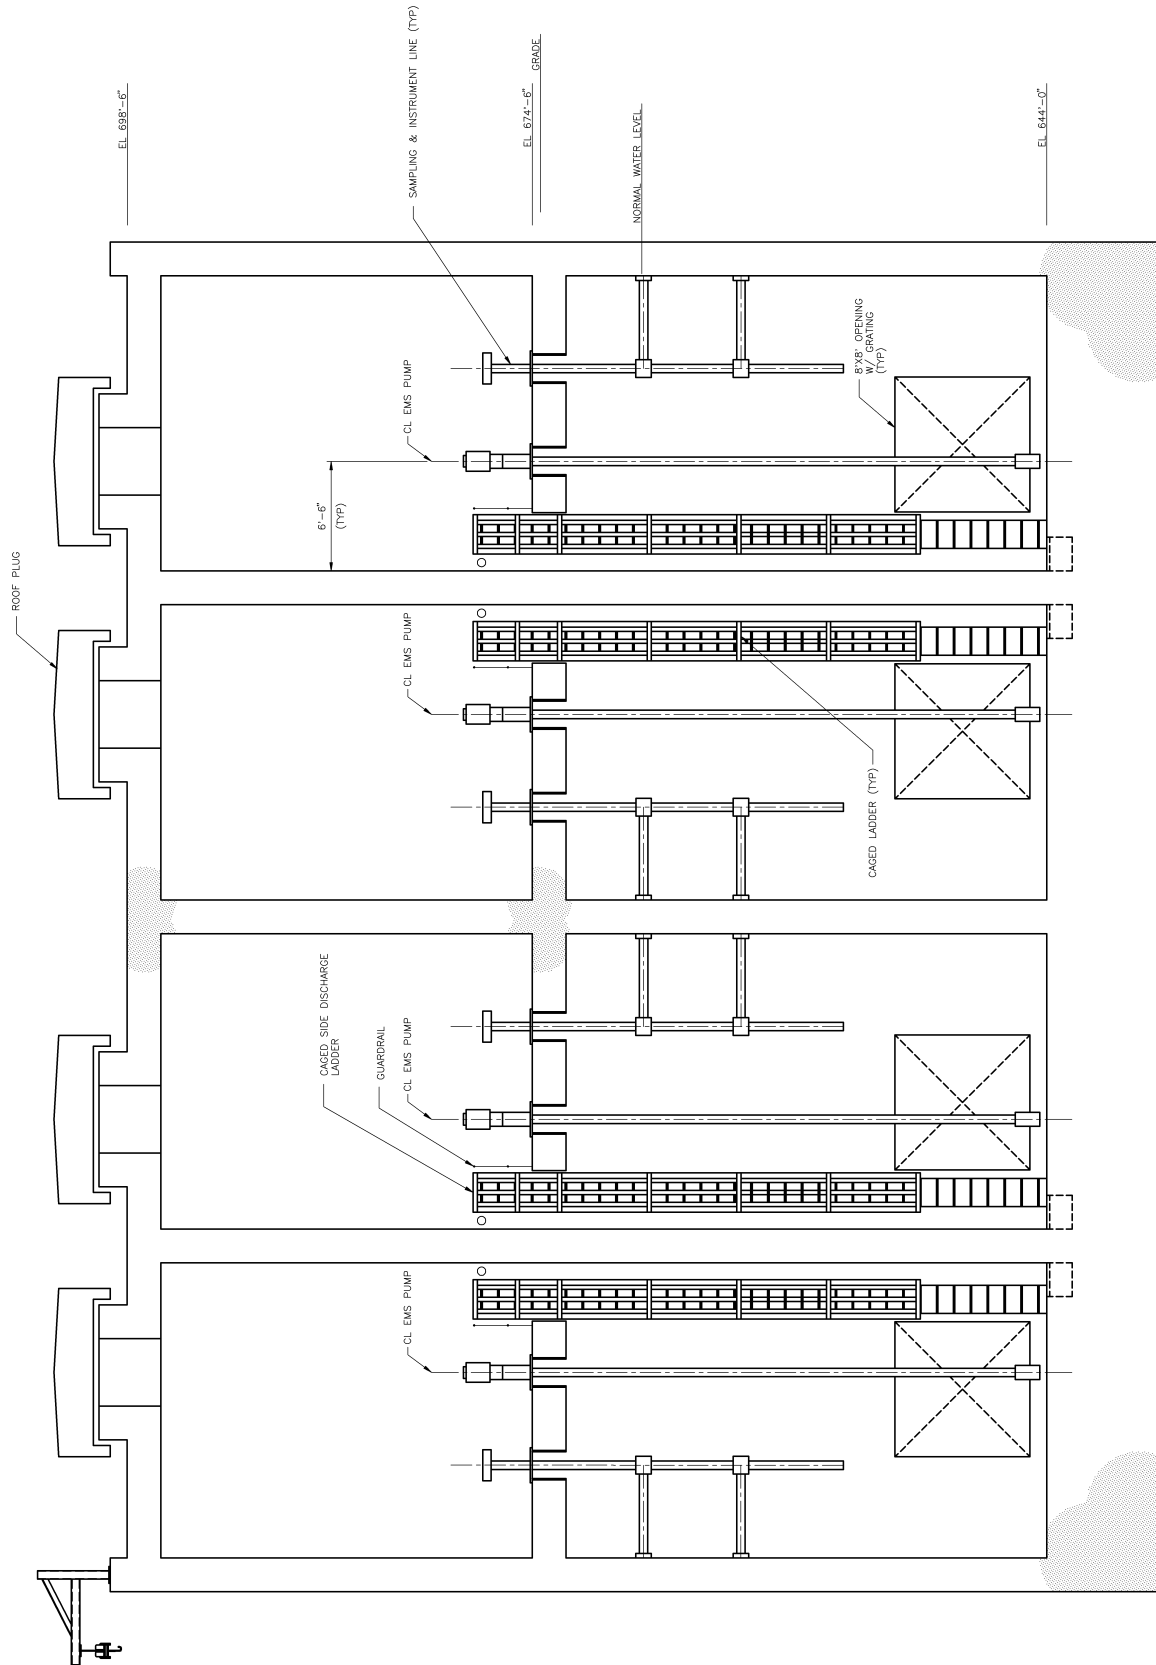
{Plant Arrangement - ESWEMS Pumphouse Pumpwell Plan}
